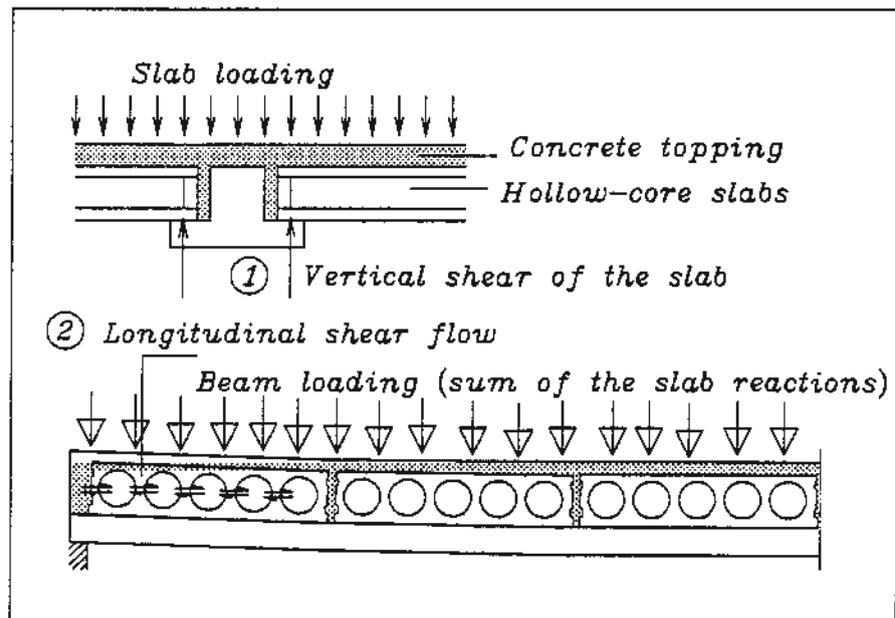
Shear forces acting on hollow-core sections when slabs are supported by beams: 1) vertical shear due to slab loading, 2) longitudinal shear flow due to composite beam behaviour.
